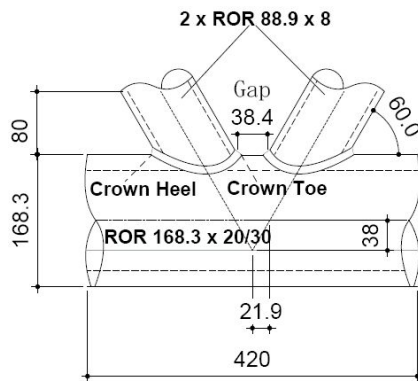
Schematic of the K shape welded joint (a ROR section is Circular hollow section designation in Switzerland).
